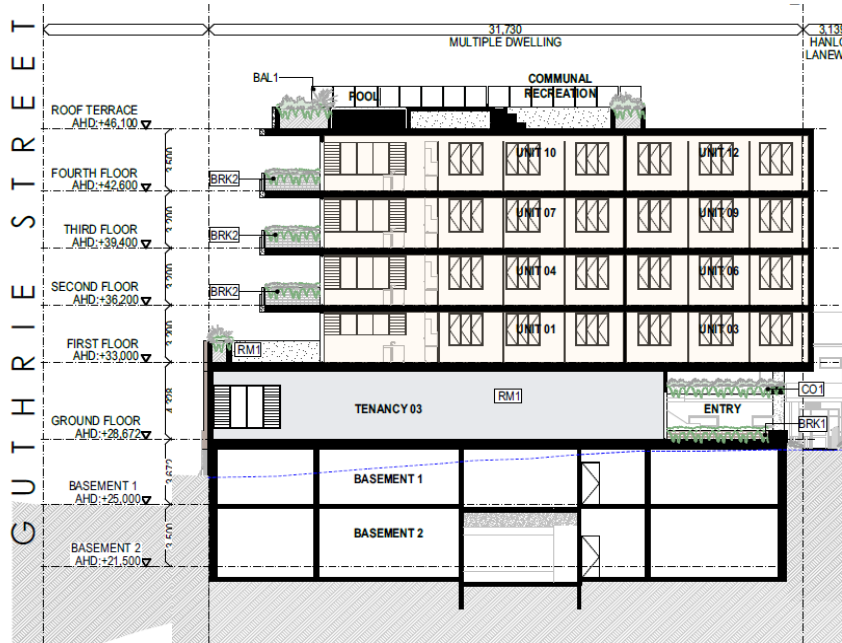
Approved Section 4 (Drawing Ref: SD403) (Source: DAH Architecture, 2024)
